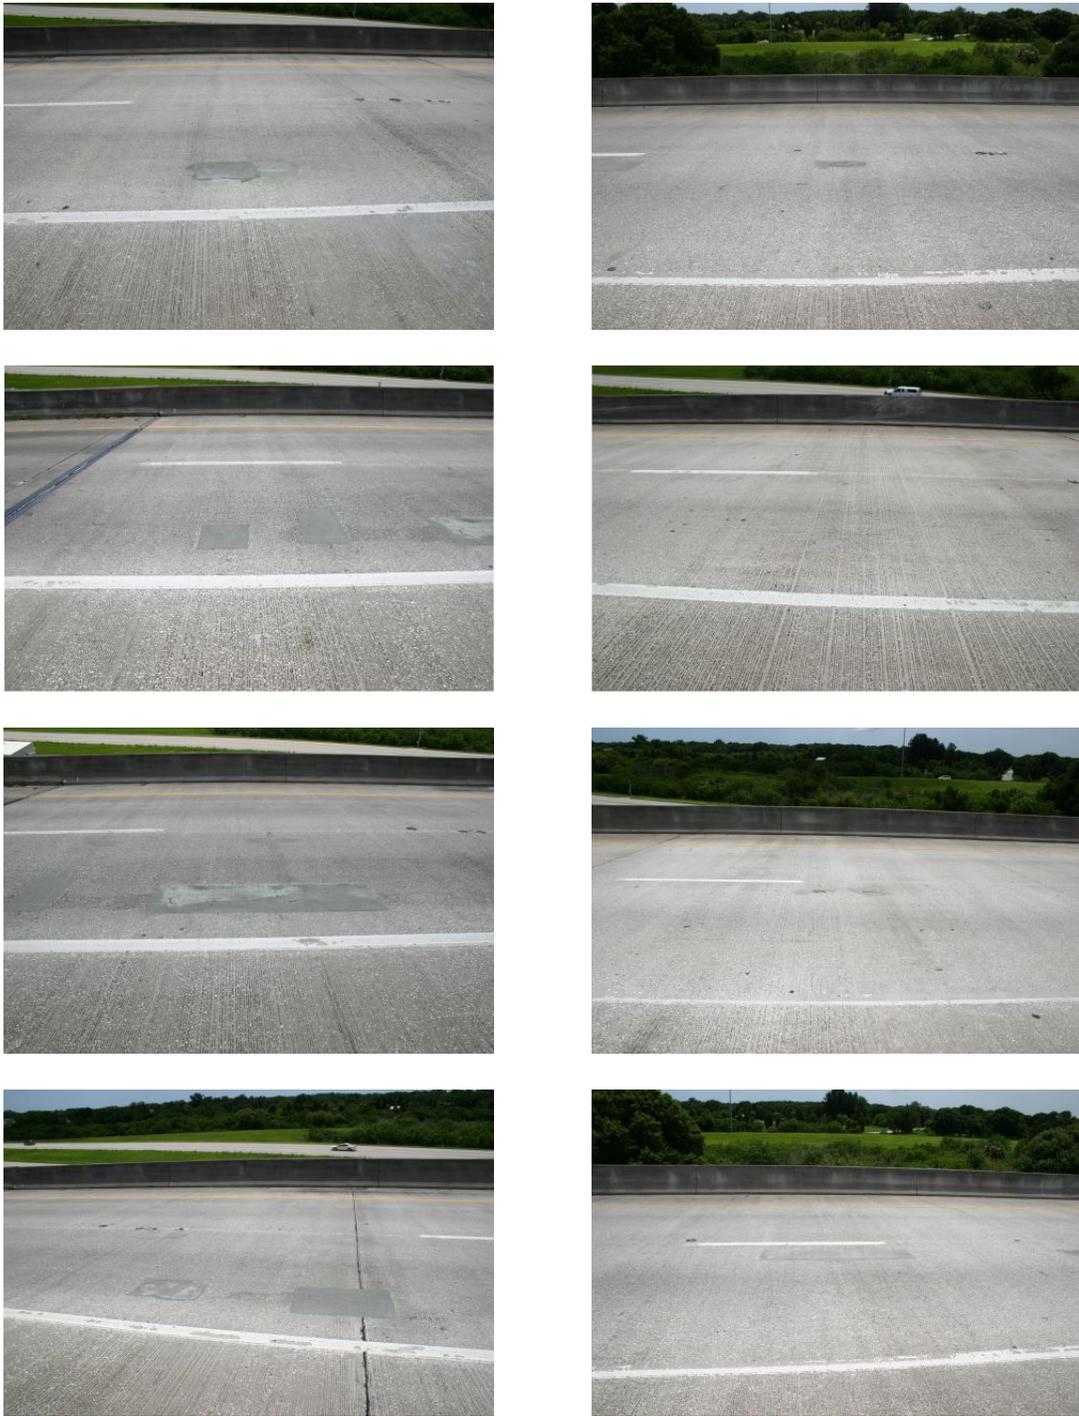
District 1 Bridge # 130090, I-275 NB & I-75
